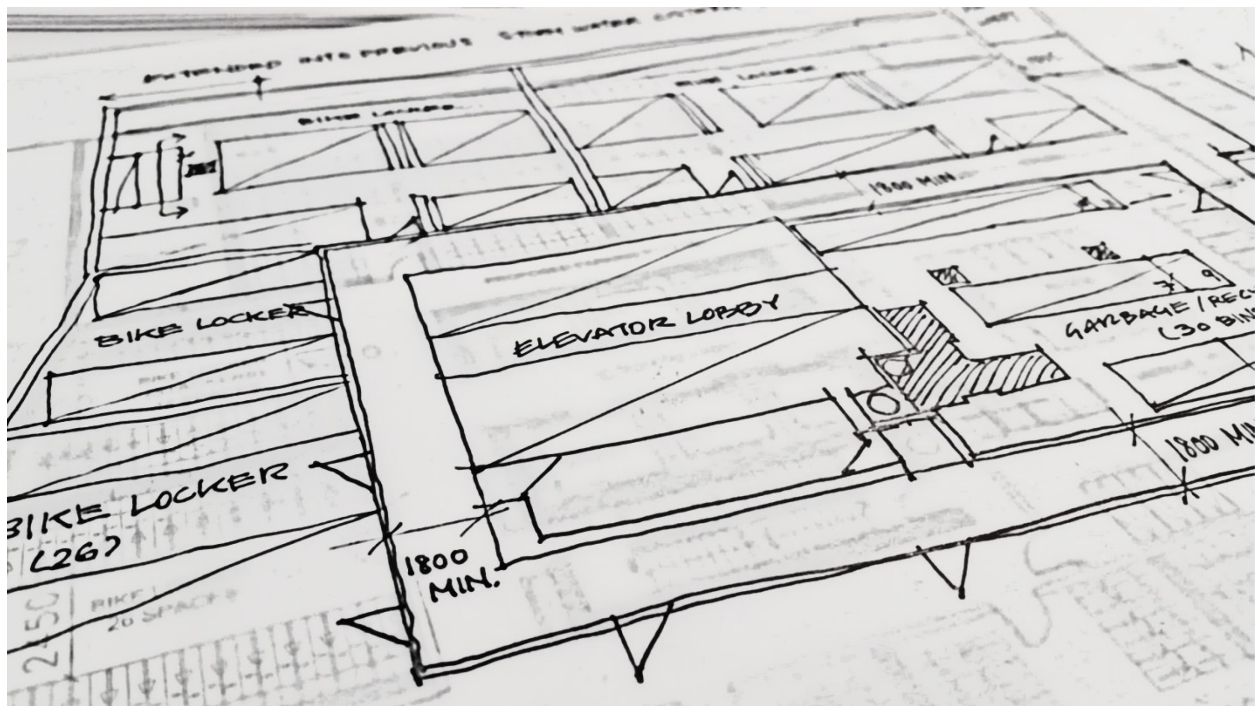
Hand drawn floor plan of condominium basement layout. (Source: By Author)
